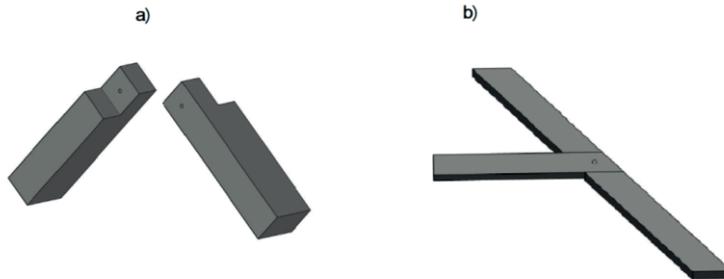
Carpentry joints: a) lap joint , b) connection of collar beam with rafter with simple lap joint. (author's study)
